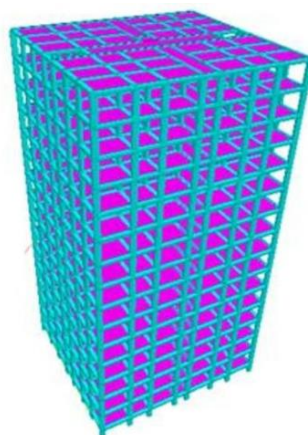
Structural model of a high-rise building using STAAD.Pro [8]
